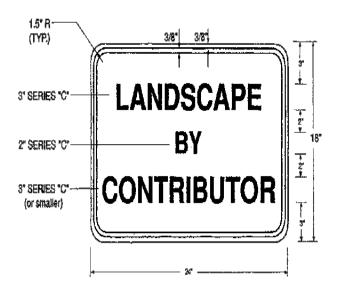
Arterial and Limited Access Landscape Roadway Sign
